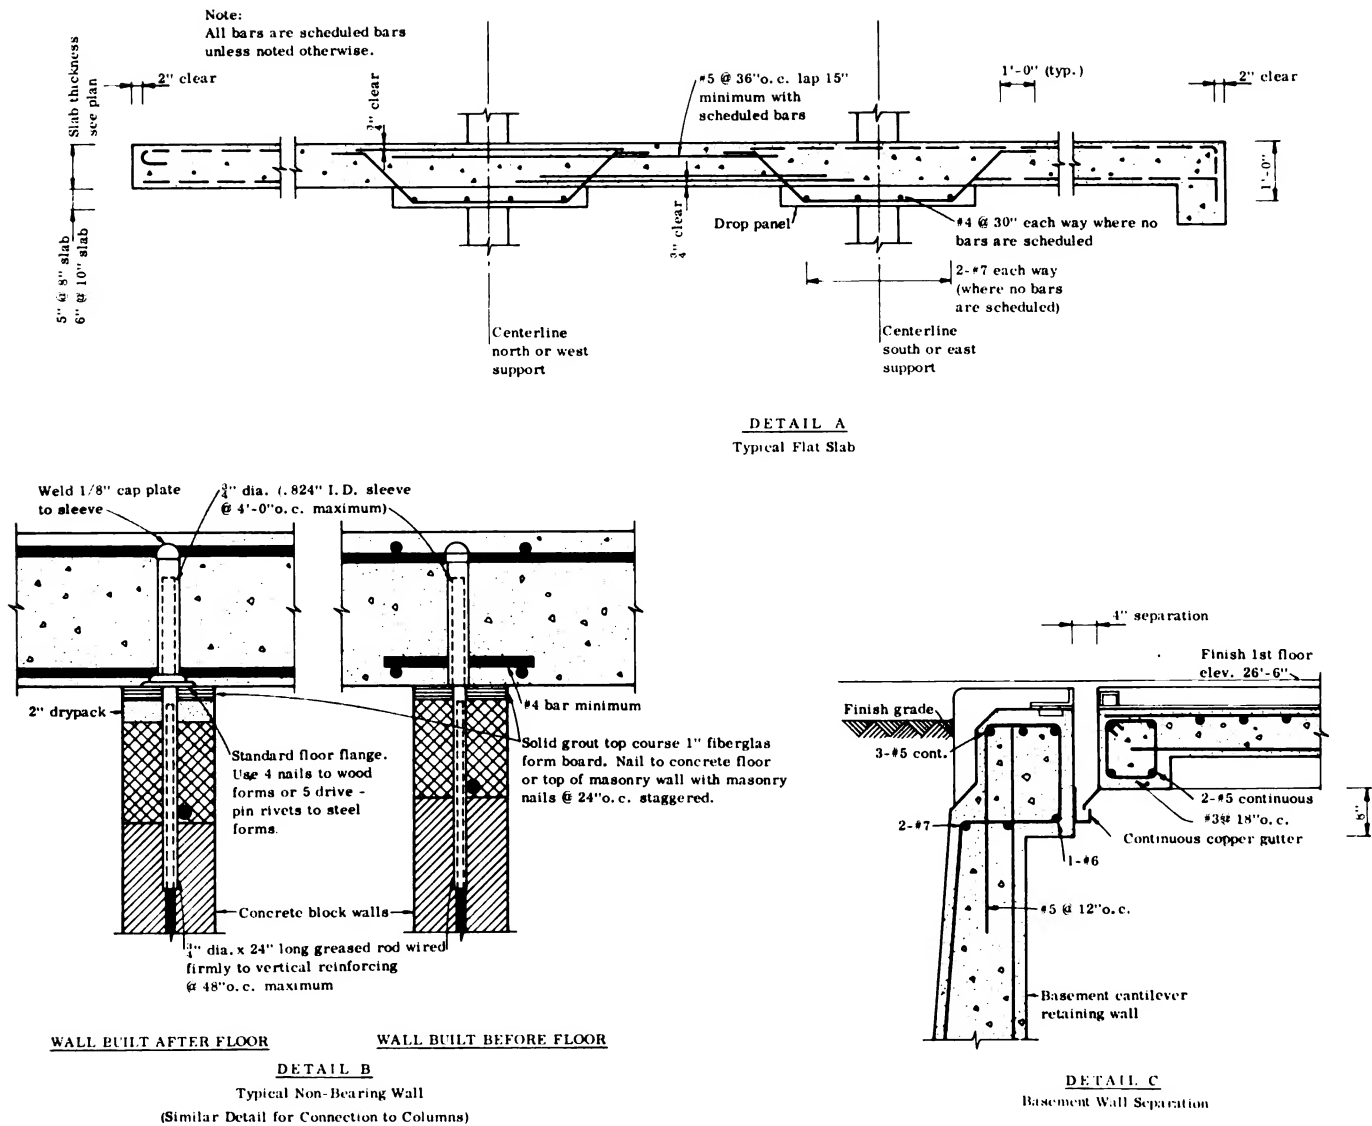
Olive View Hospital, medical treatment and care unit. Typical details of flat slab, nonbearing wall, and basement wall separation at first floor.
